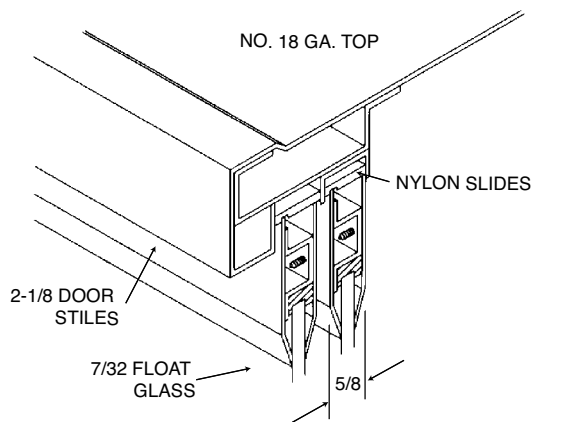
DETAIL OF FRAMELESS GLASS SLIDING DOORS AND TRACK AT BOTTOM OF WALL CABINET
